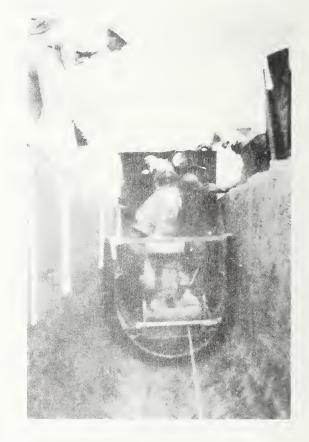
CONTINUOUS PLACEMENT OF CAST-IN-PLACE PIPE
